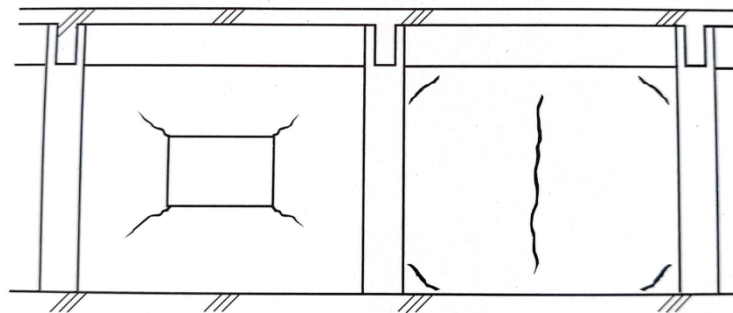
Example of dry shrinkage cracks in building exterior walls [11].
